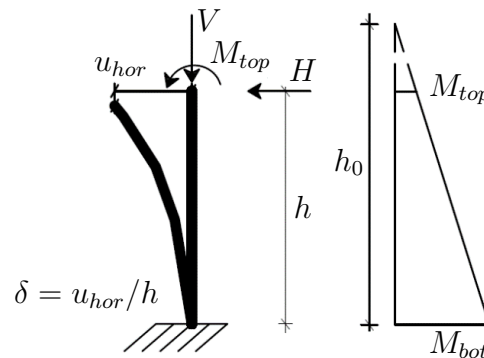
Deformed Shape and Moment Profile of URM Wall (Beyer and Petry, 2015)
